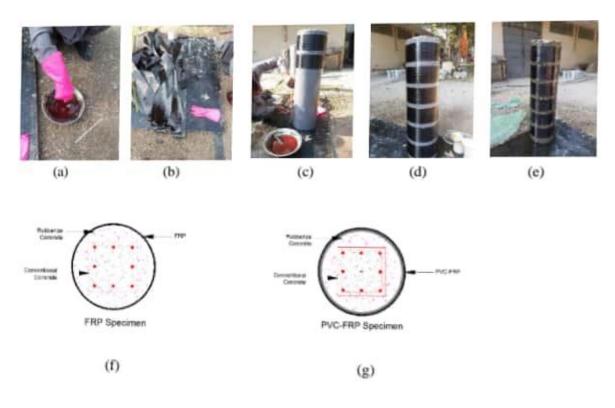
(a) Epoxy, (b) CFRP strips, (c) Application of CFRP, (d) CFRP wrap on PVC, (e) CFRP wrap on modified concrete, (f) FRP specimen arrangement, (g) PVC-CFRP specimen arrangement.
